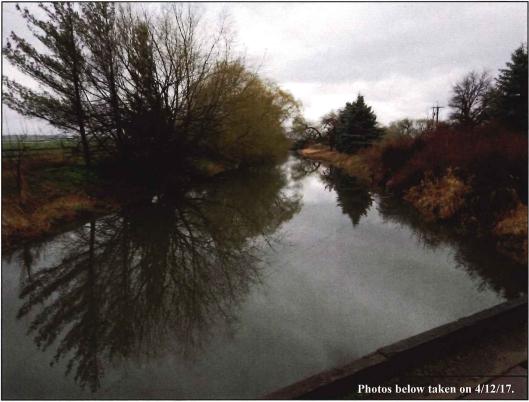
Photo L. View northwest of EP Canal at first crossing near the road crossing bridge.
